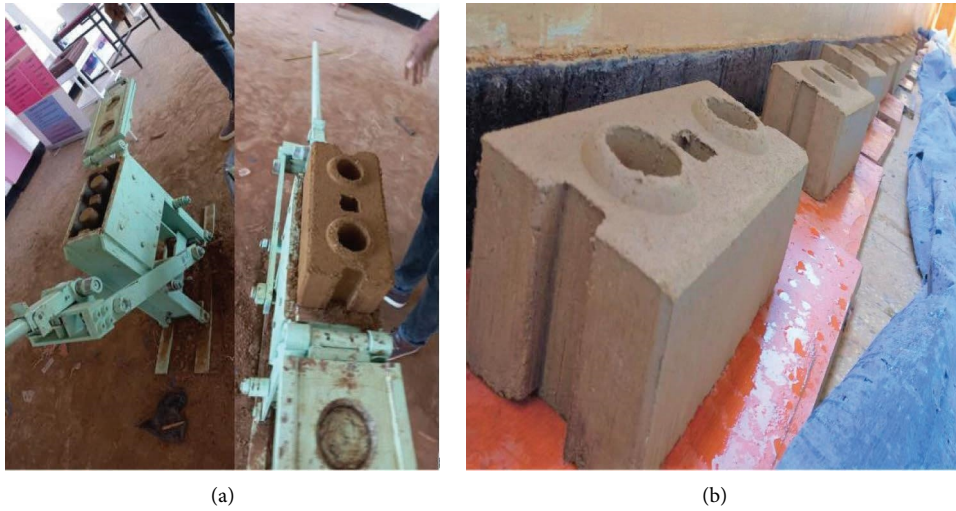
(a) Compressing machine and (b) wet soil block placement.
